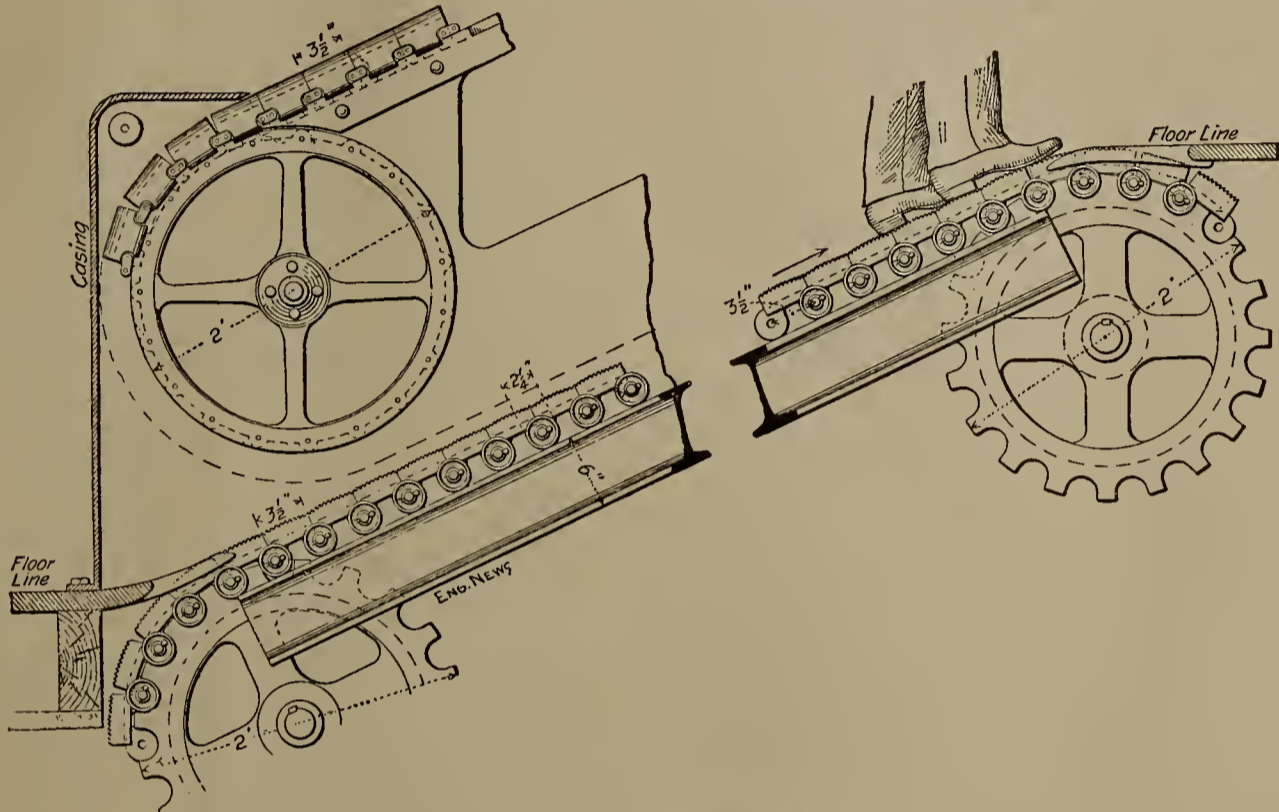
DETAILS OF INCLINED ELEVATOR.
